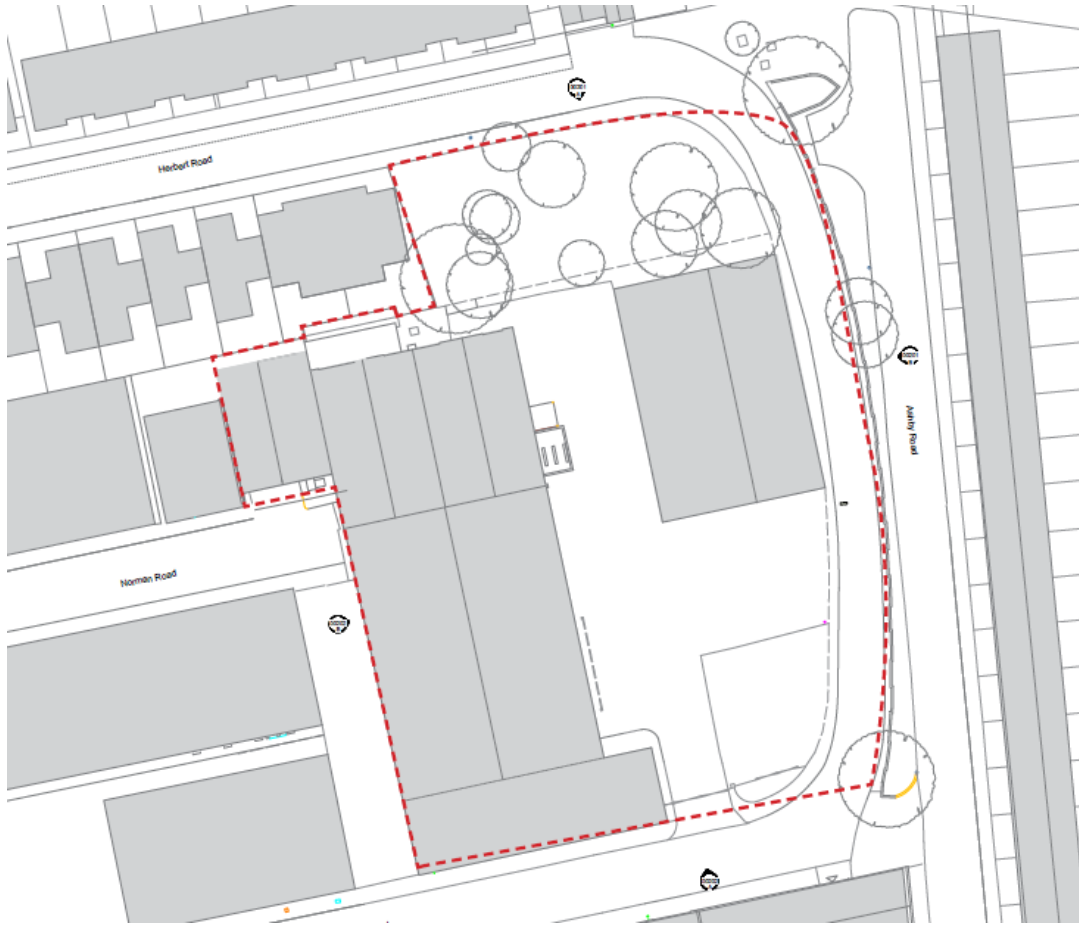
Existing site (Dual Road Layout – Looking south Ashby/Herbert Roads)
